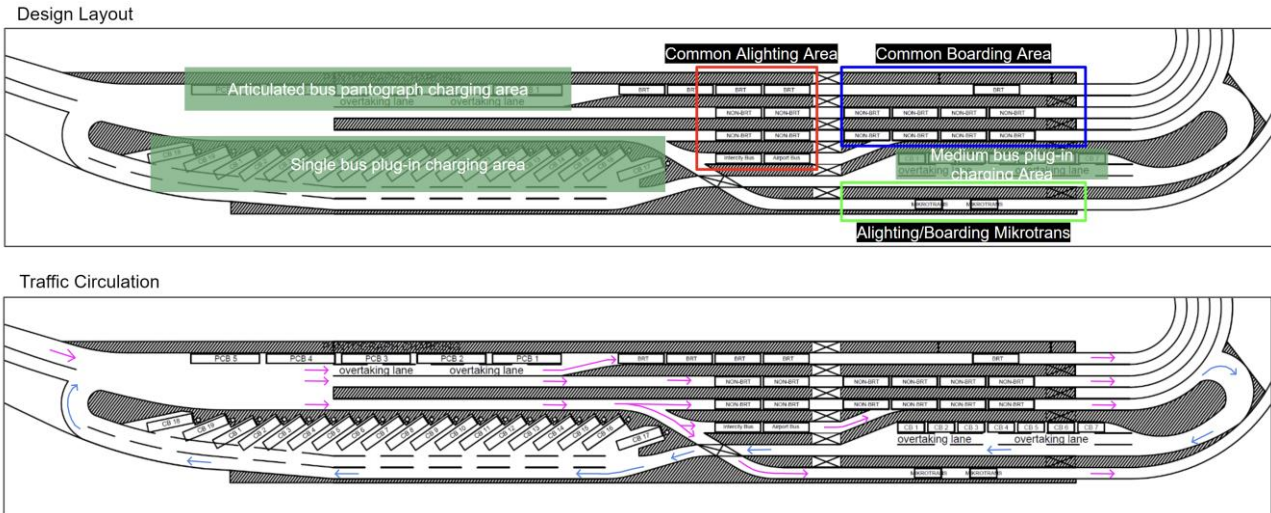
Proposed design layout and traffic circulation for e-bus charging at Blok M, alternative 1
